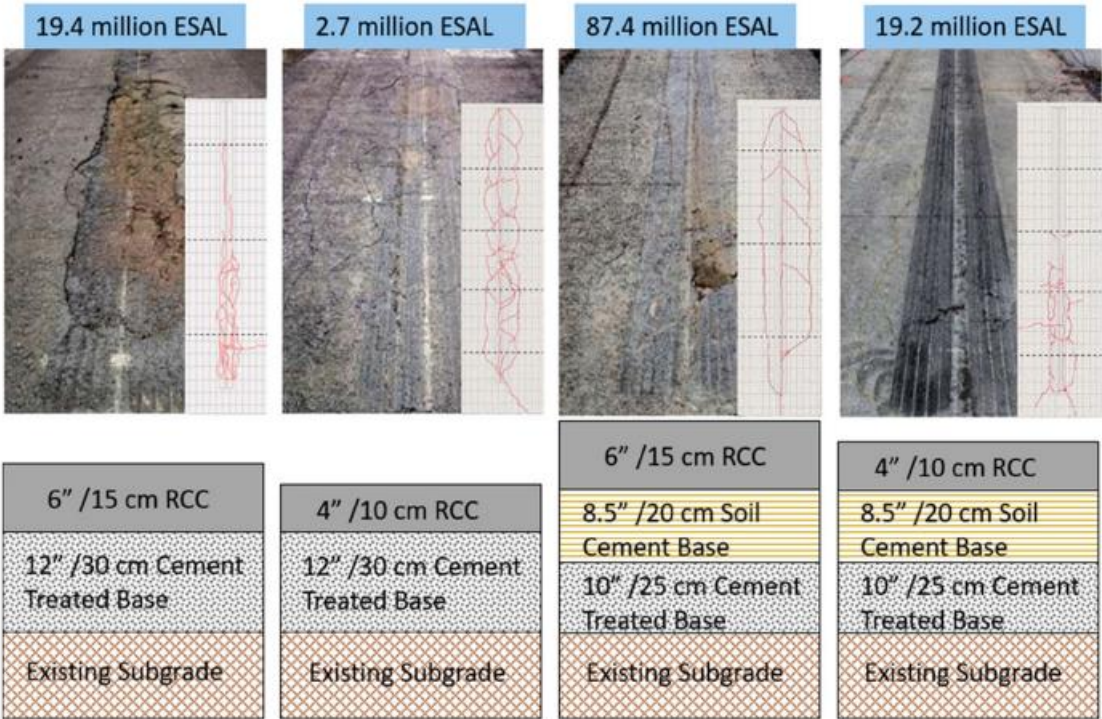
Example of pavement fatigue cracking after ATP testing (Sengun et al., 2024b)
